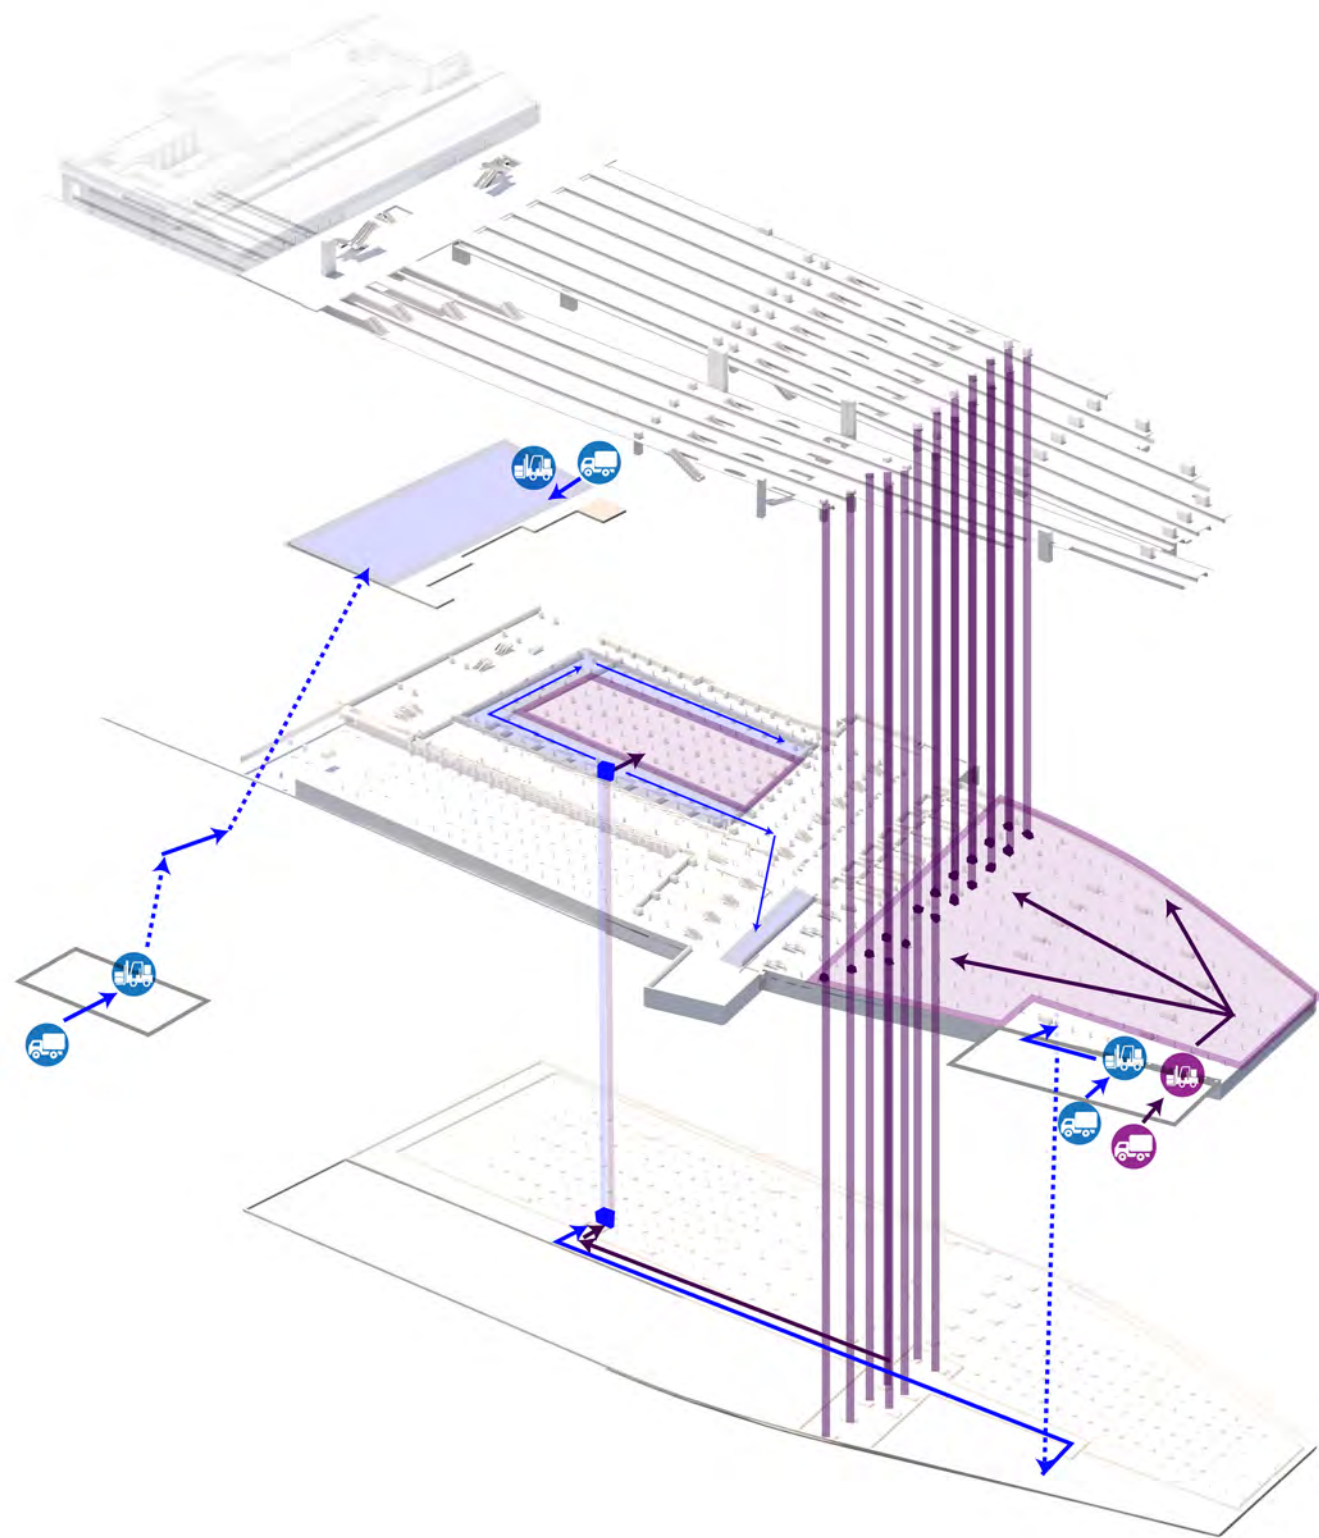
LOADING AT CORNER OF K AND 2ND STREETS
